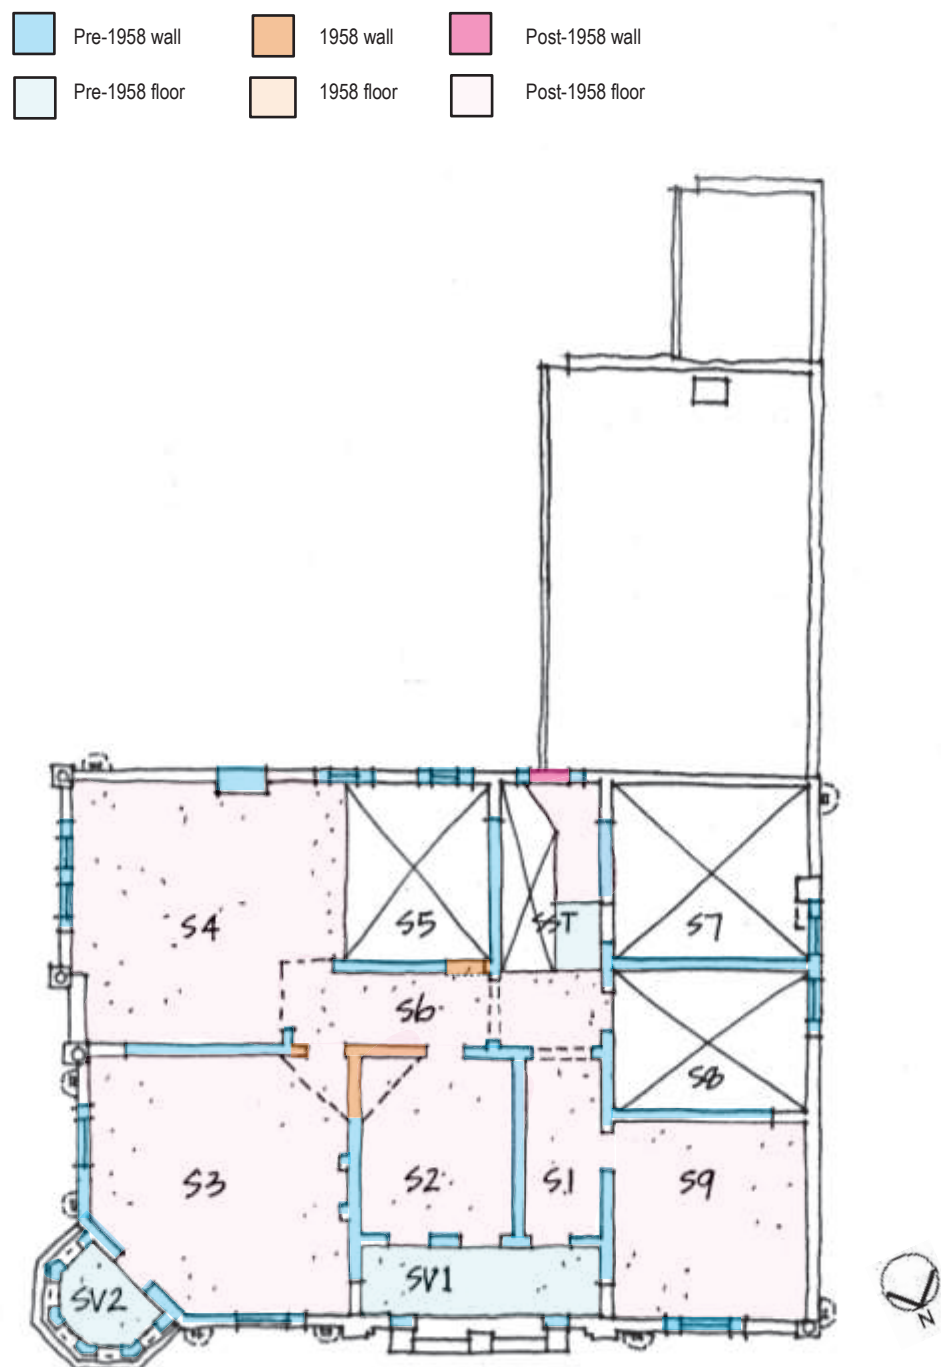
Diagrammatic second floor plan showing existing fabric from different eras
